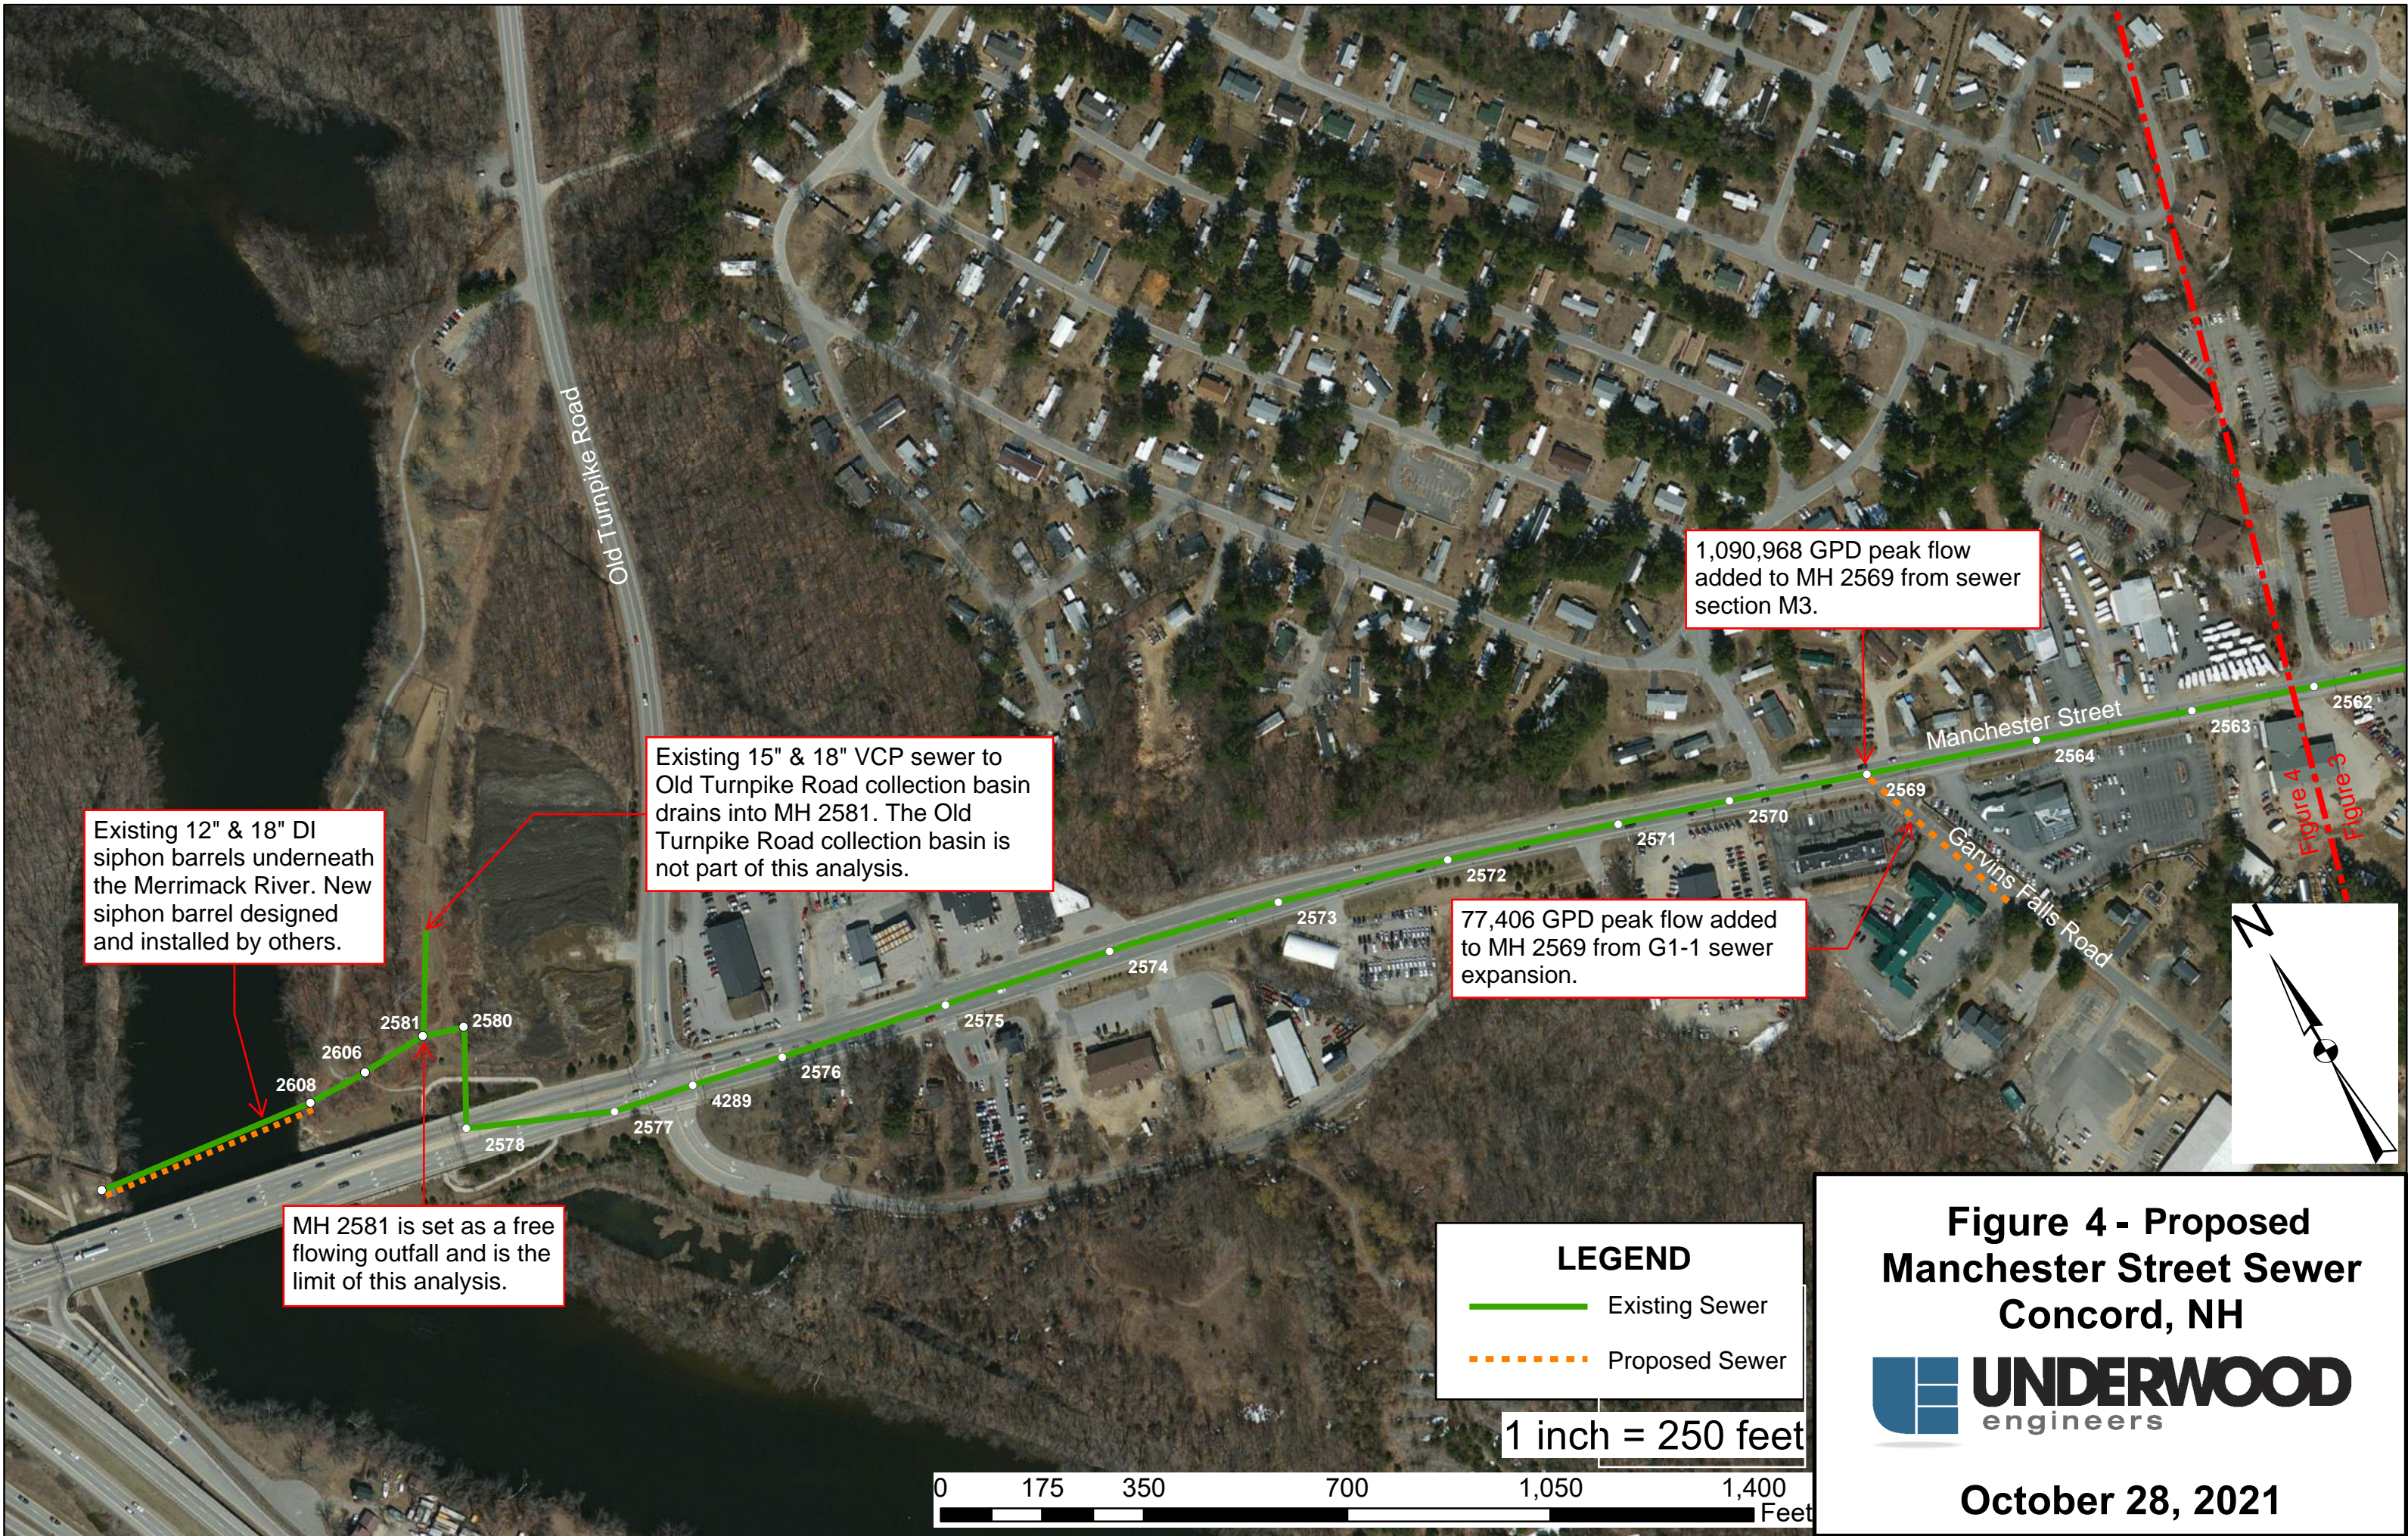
Proposed Manchester Street Sewer Concord, NH
